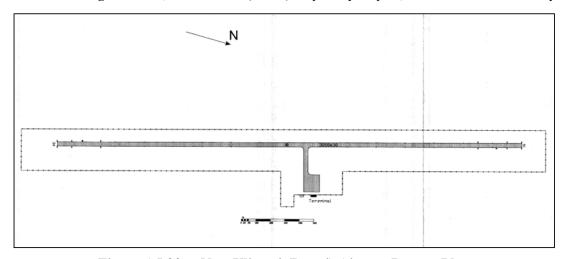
New Uliastai (Donoi) Airport Layout Plan
